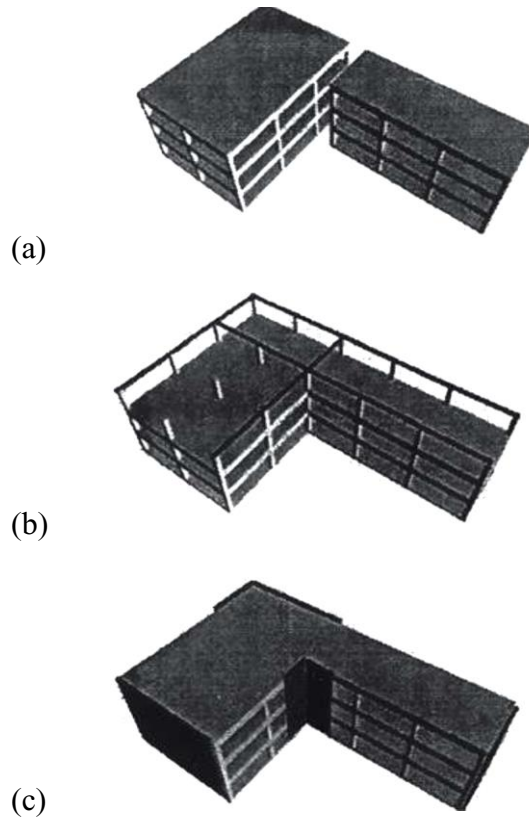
Solutions for the re-entrant corner condition (a) separation of building (b)strengthening notch (c) adding stiff elements at notch
